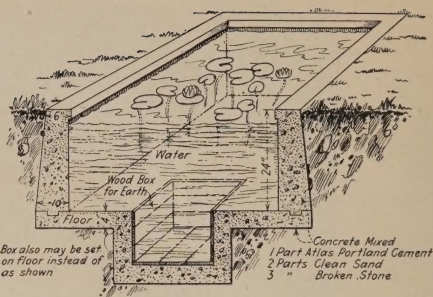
Drawing of a section of concrete lily pool with arrangement for removable box.
